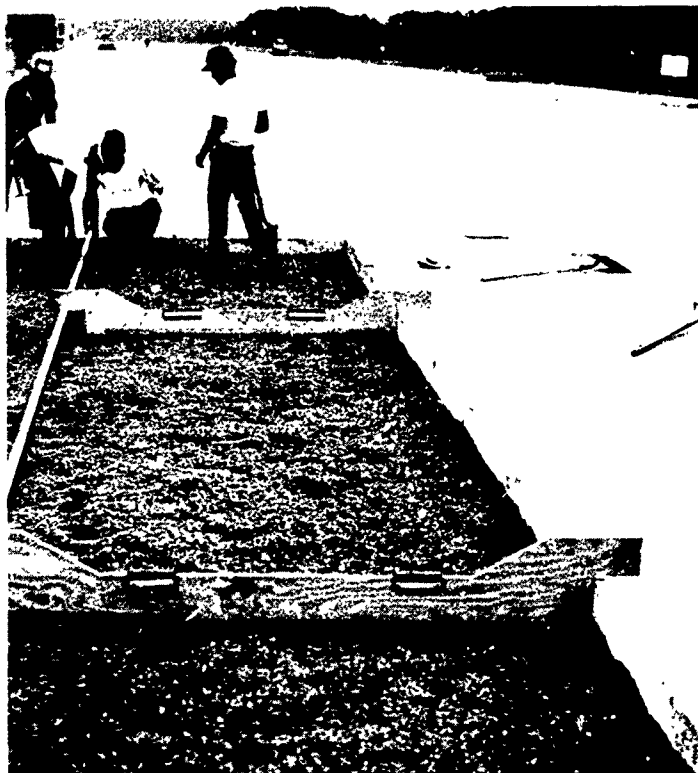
Screed boards and pipe set to screed for the first row of slabs in the precast slab repair
